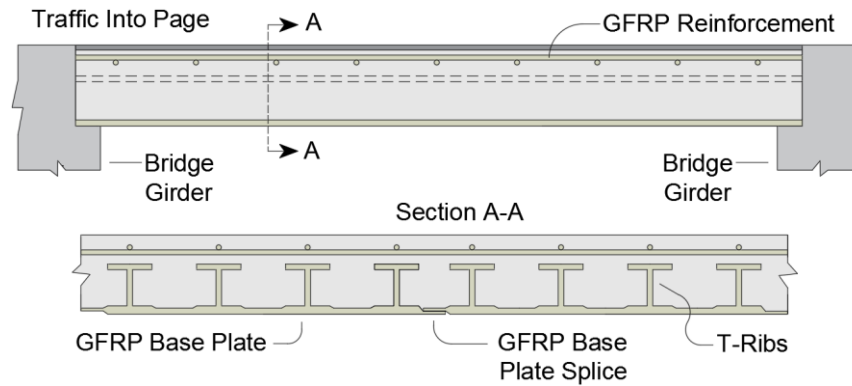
Typical configuration of GFRP stay-in-place T-up formwork.
